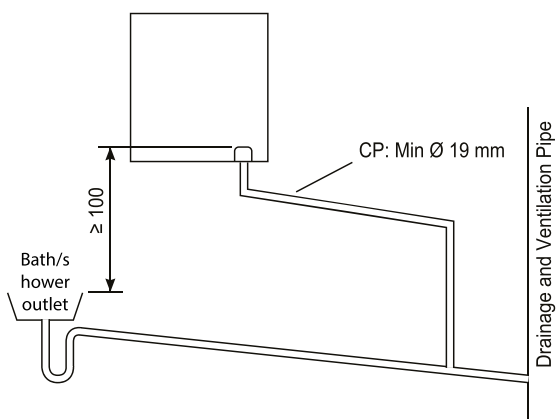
Connection of Condensing Water Drainage Pipe to Bottom Level of Interior Bath Outlet Siphon
